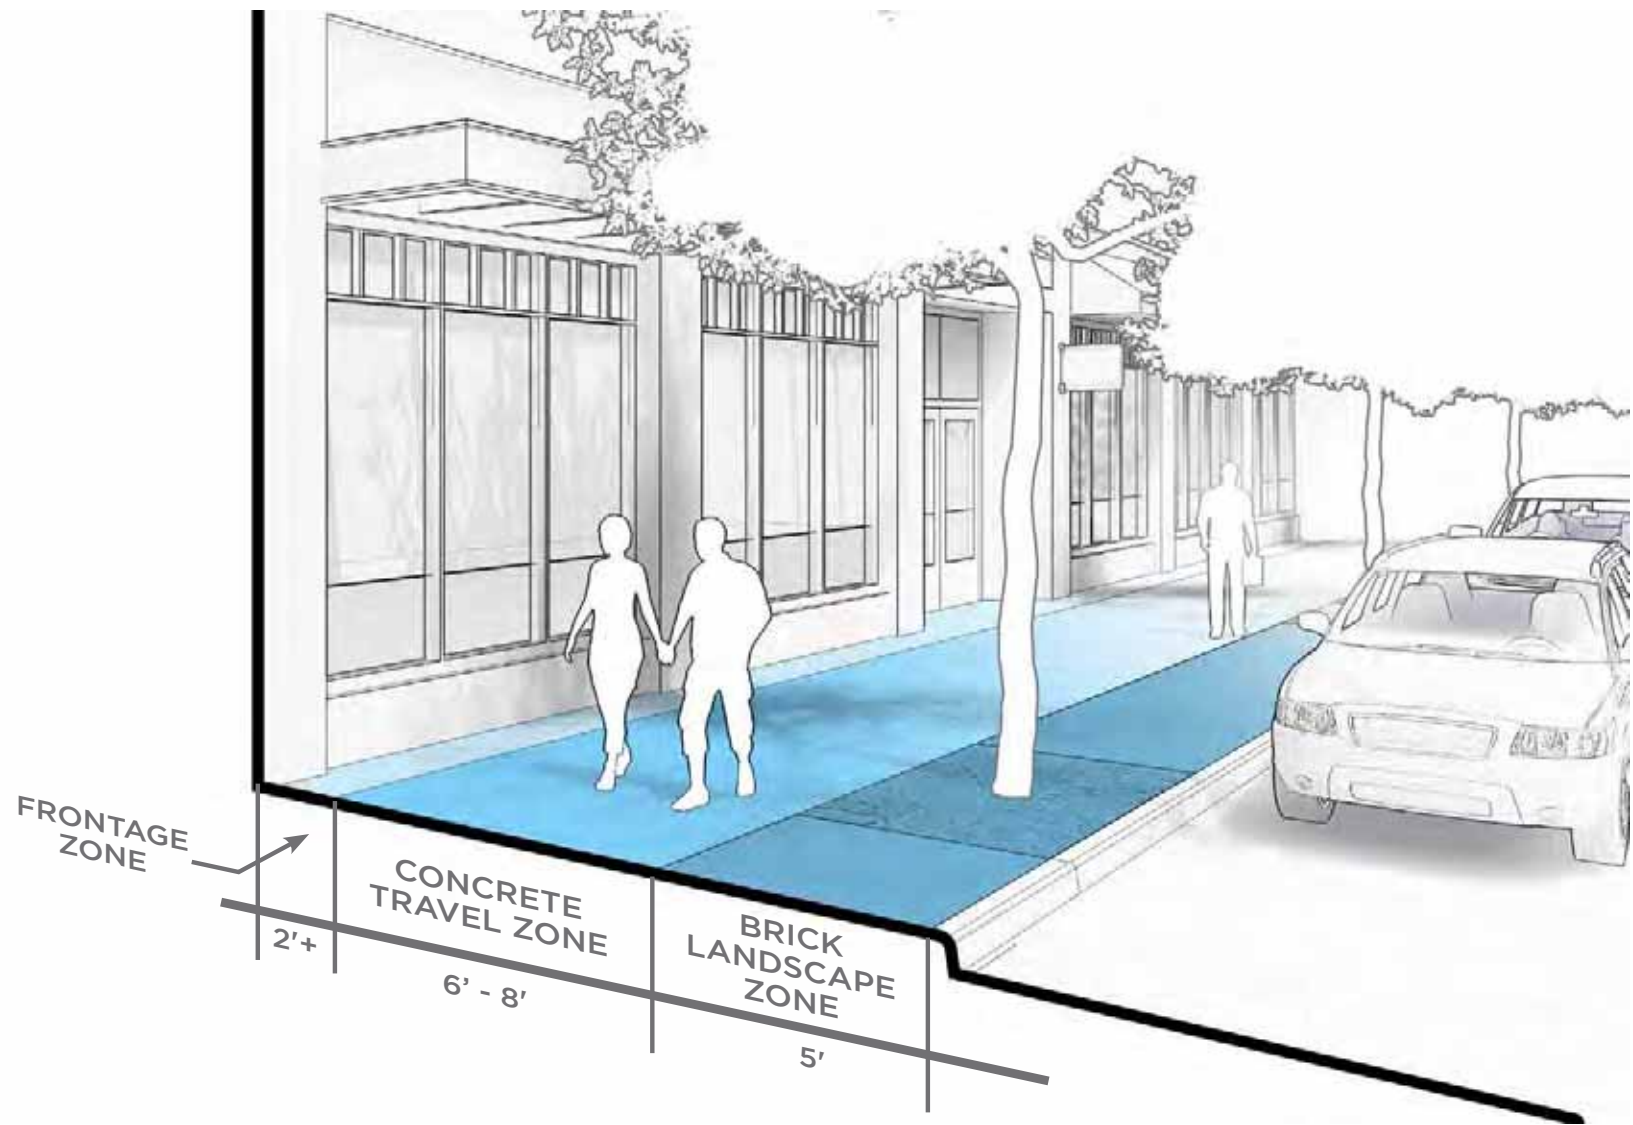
Proposed West Gateway Streetscape Typology Section
